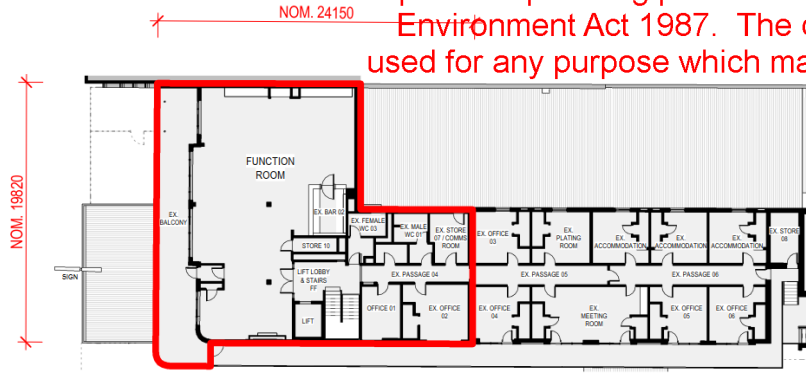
Extract of Proposed Ground Floor Red Line Plan (Insite Architects)
